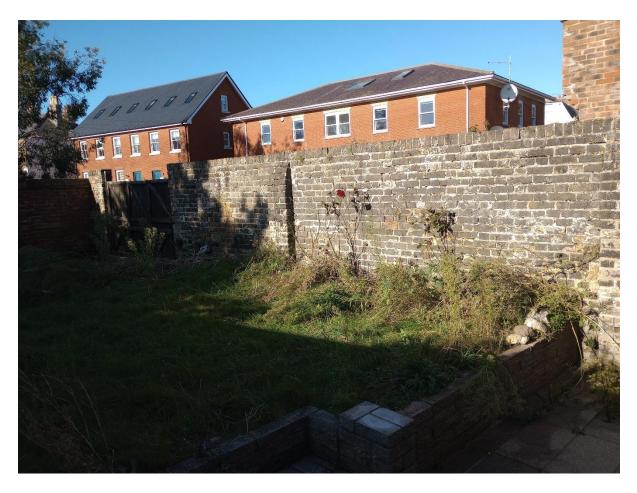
Garden boundary wall with three storey residential apartments beyond.
